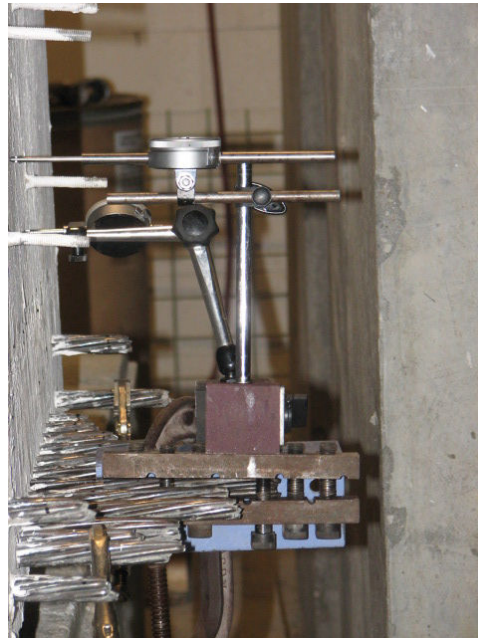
Caliper displacement gauges attached to the lower strands- side view
